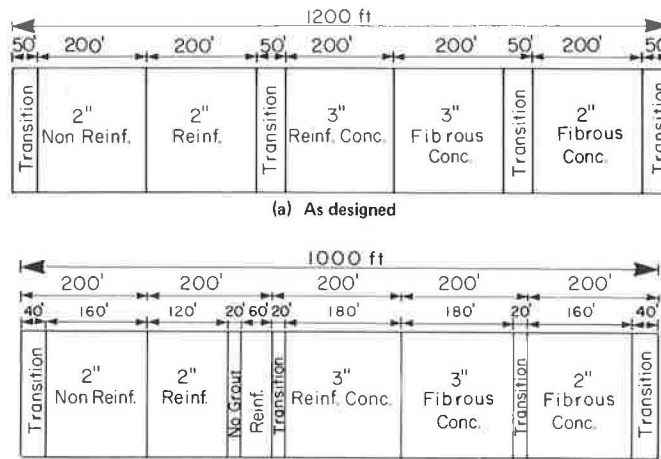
PLAN VIEWS of the Loop 610 and Houston test sections.
